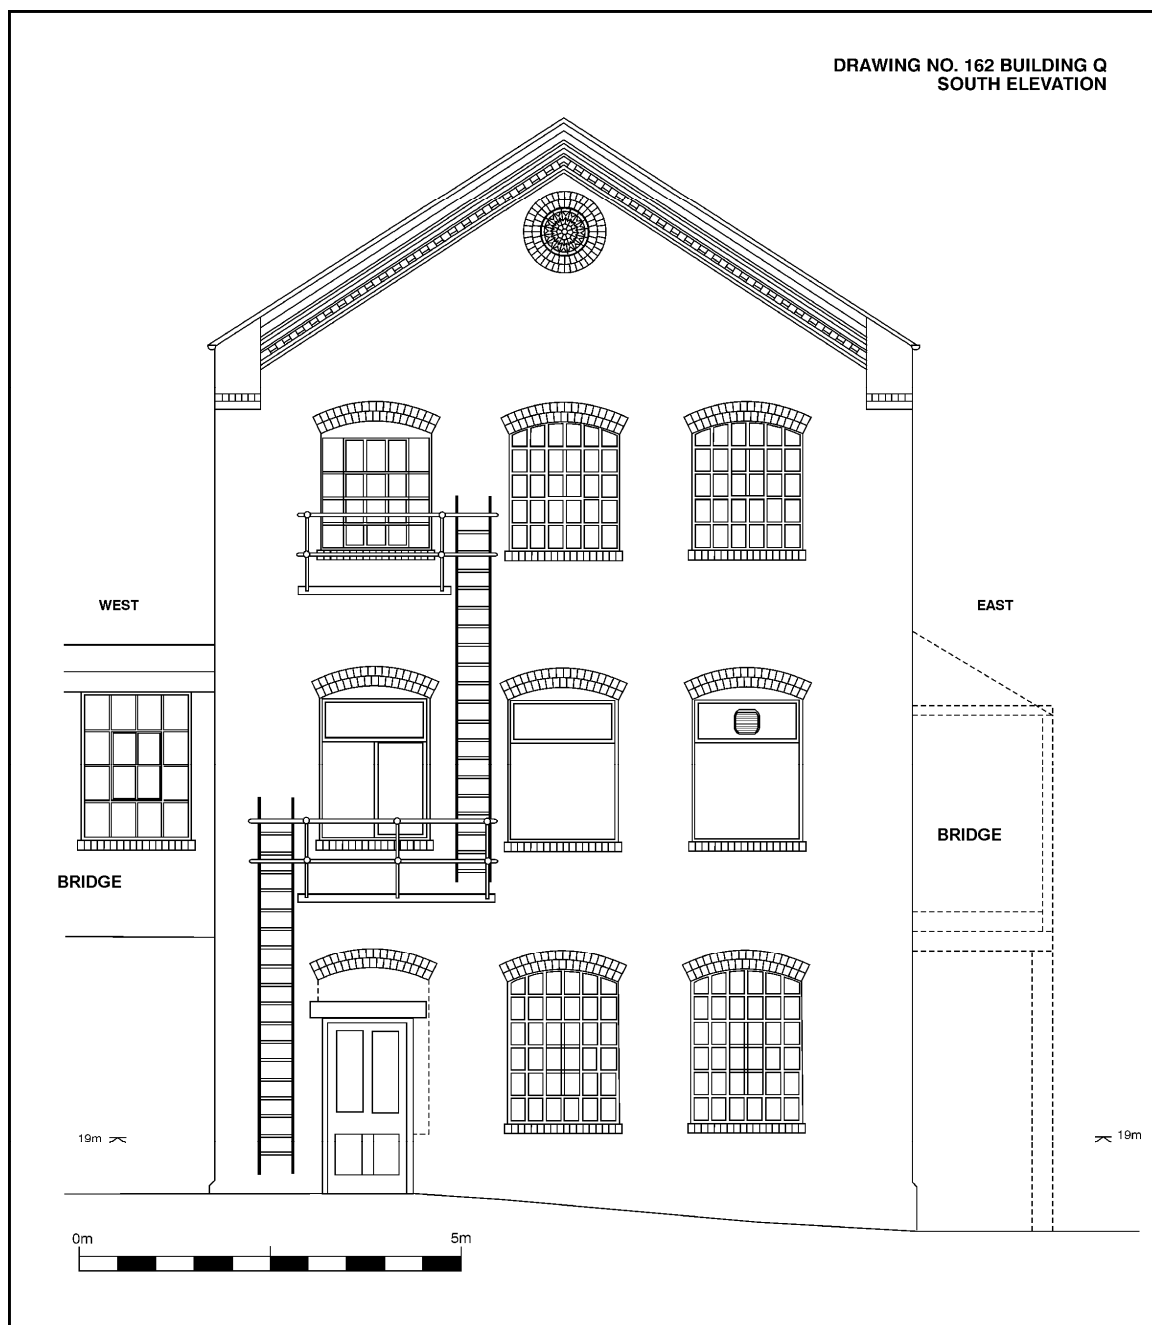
Survey drawing of the south elevation of Building Q (scale 1:100)
